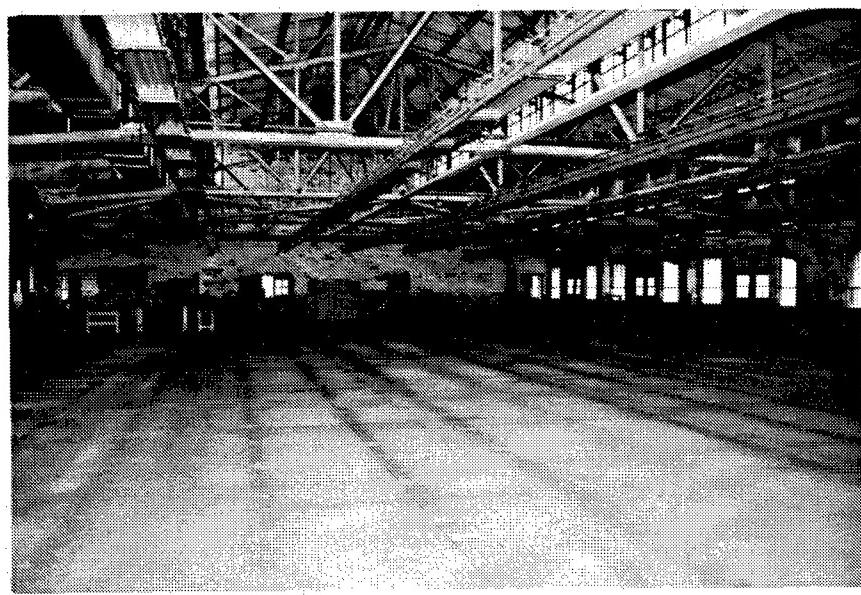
Building 2F-32: Interior view of this Fuze Assembling Building.
